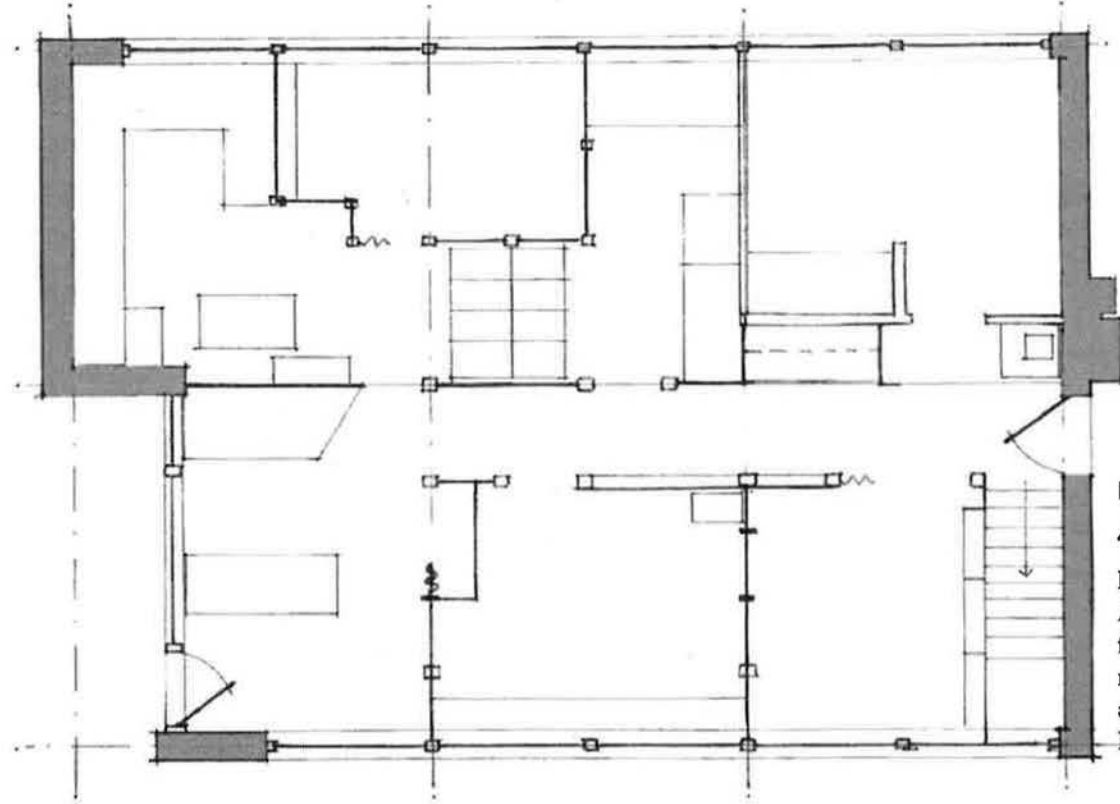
Wells-Denbrook Architectural Office main floor studio plan, 1964 revised layout from 1971 as-built. Not to scale
